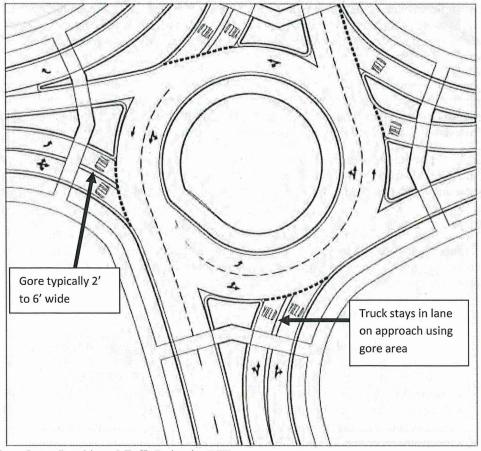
Example Pavement Markings for Trucks at Multilane Roundabouts
